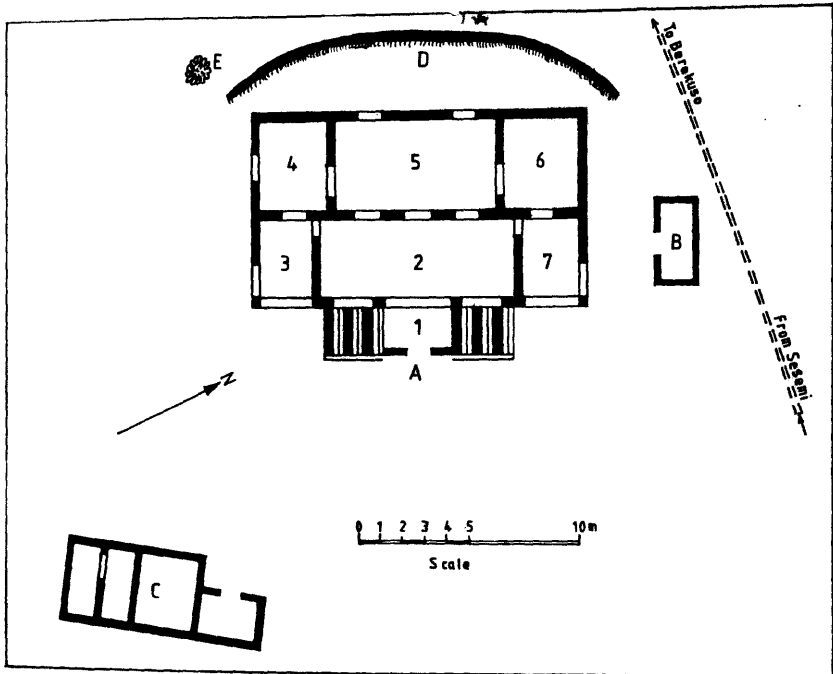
Plan of the Frederiksgave Plantation house and other structures
